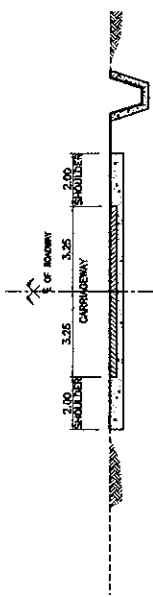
(1/2) Metro cagayan de Oro : Proposed Cross-Section for Widening and New Roads
